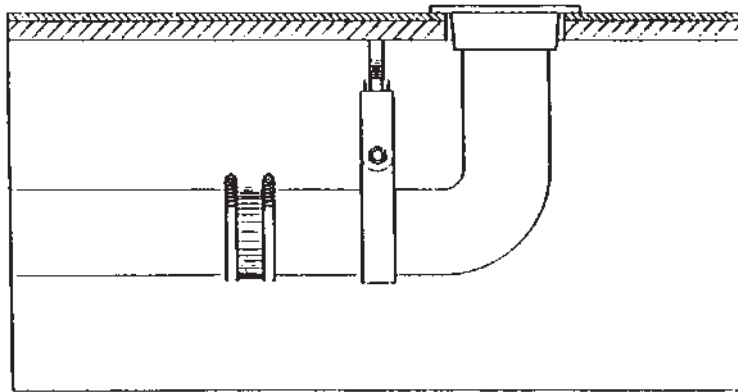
METHOD OF USING HANGER FOR CLOSET BEND
